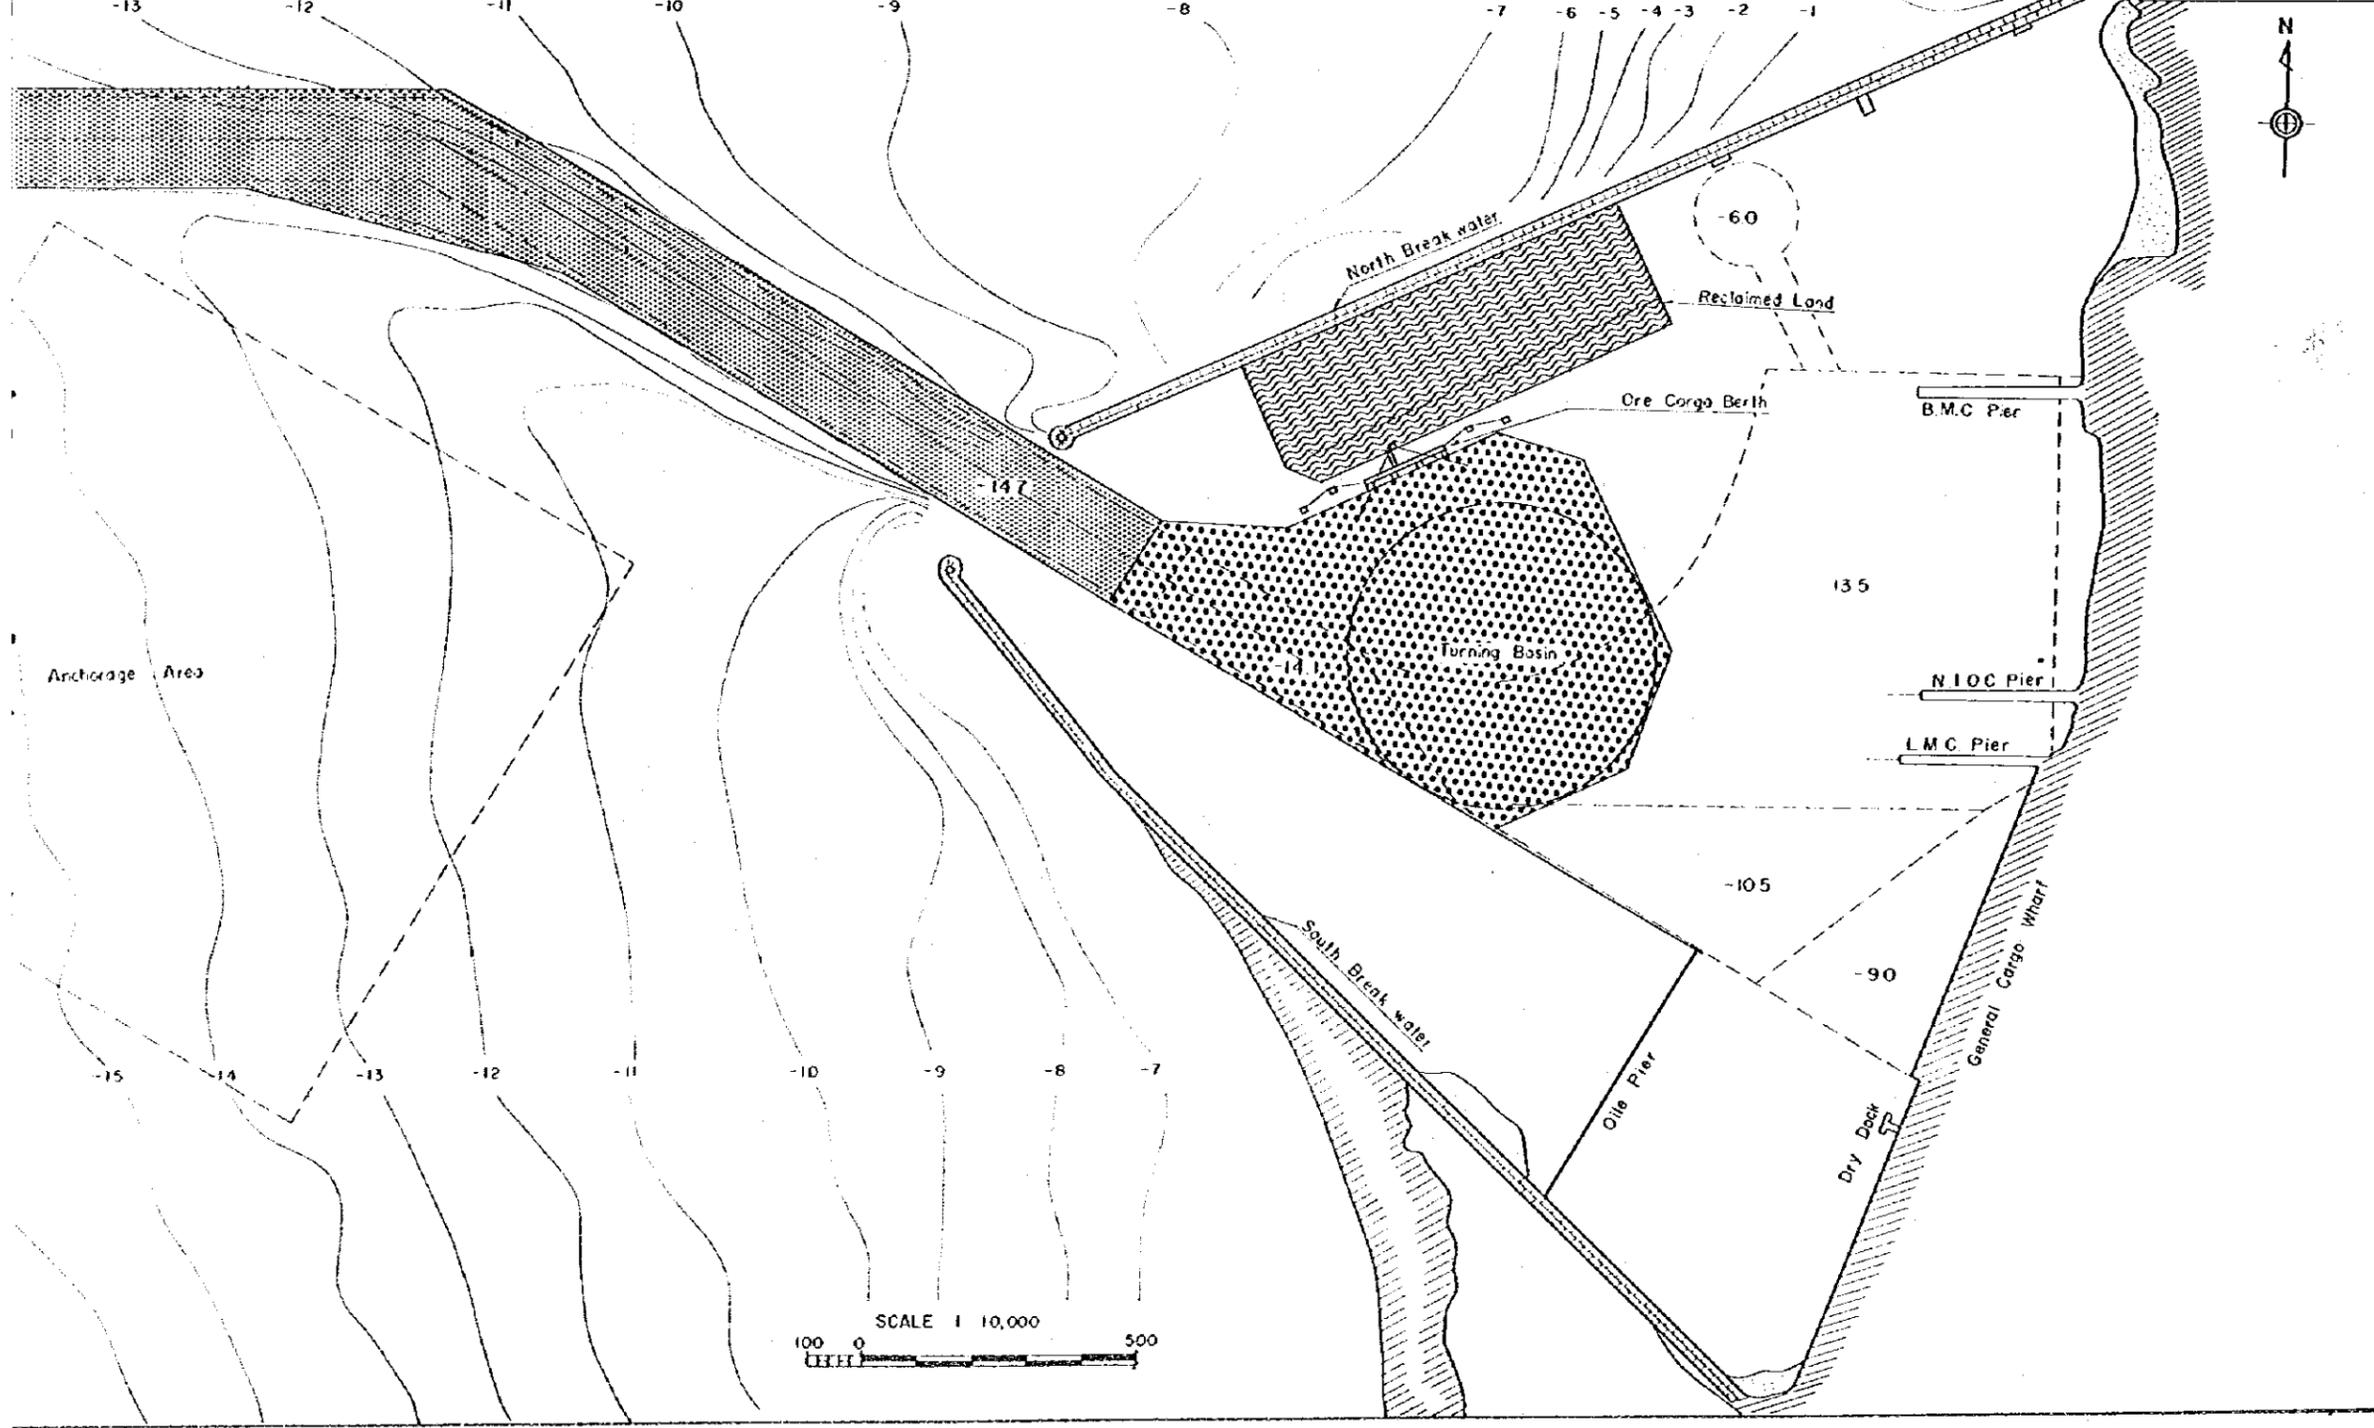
DREDGING PLAN / MONROVIA SITE / ALT. II
